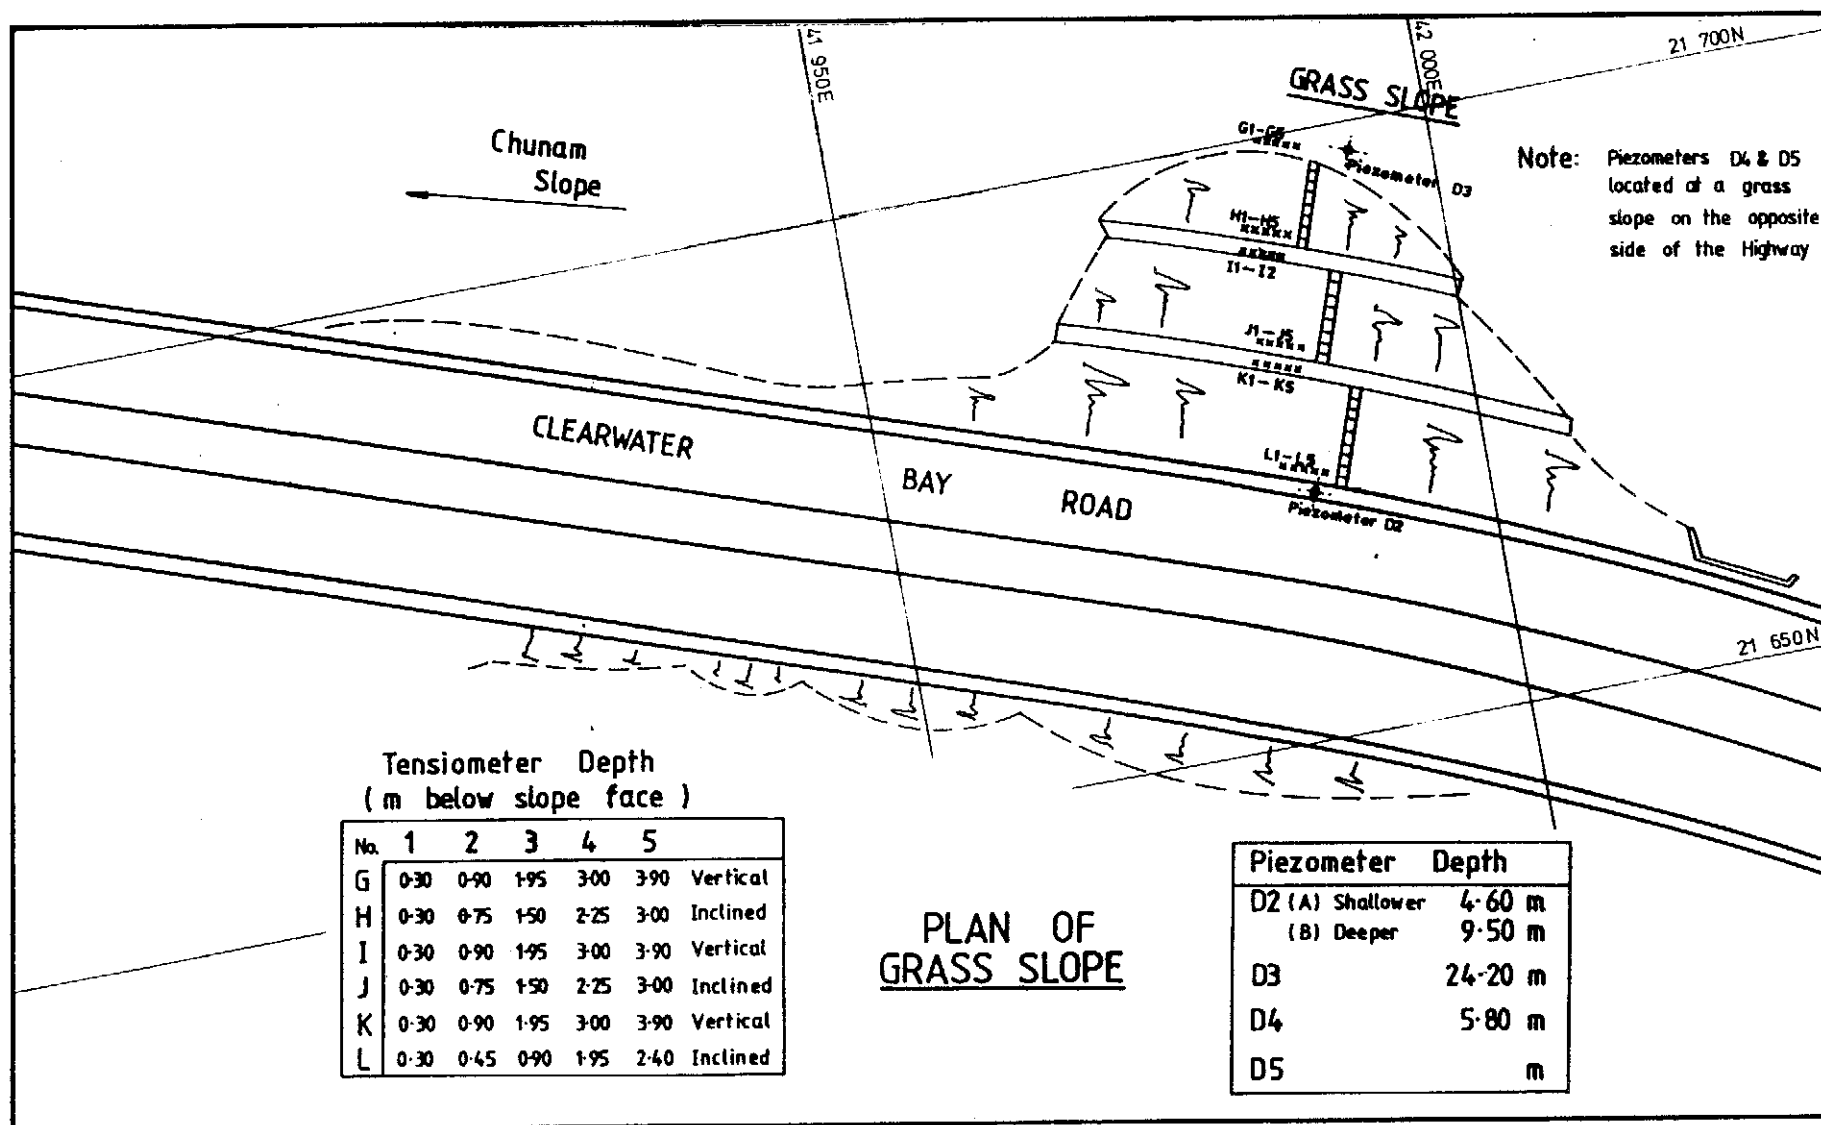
Site plan of the grass slope, Clear Water Bay Road (see figure 1.7)
